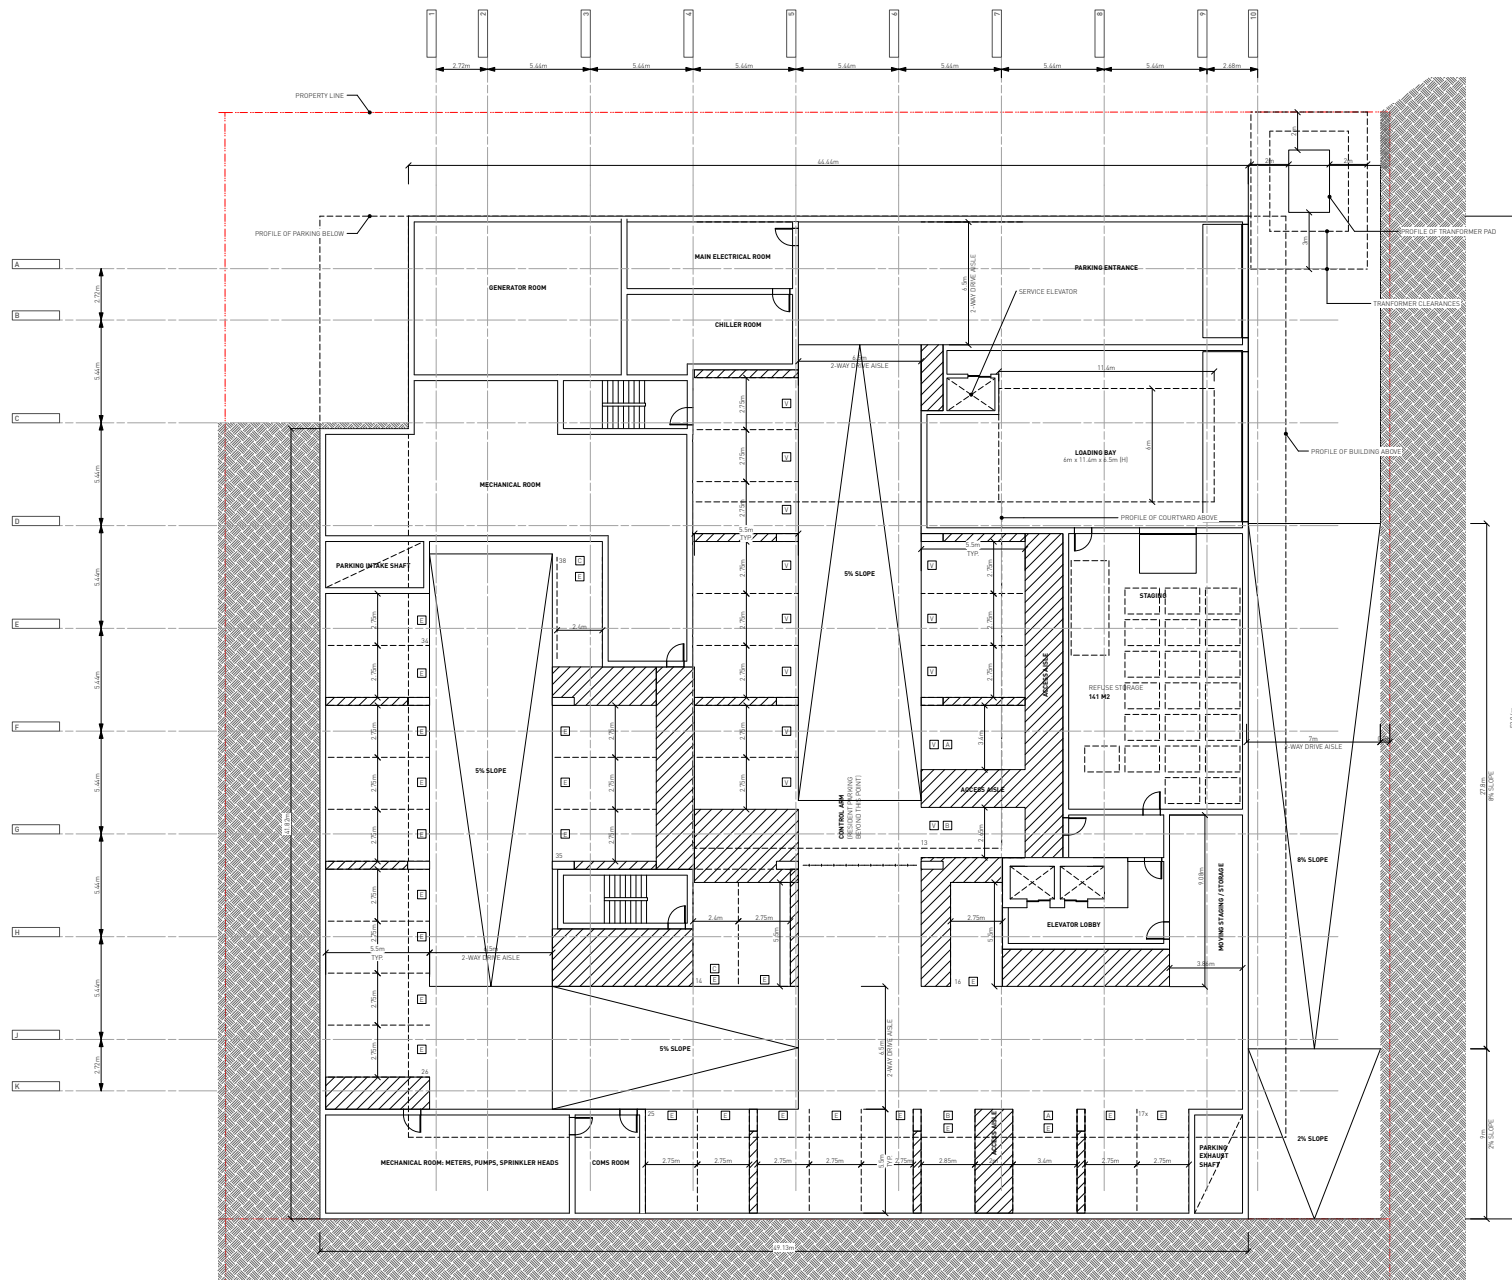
P1 (Parking Lower Level) prepared by 5468796 Architecture
